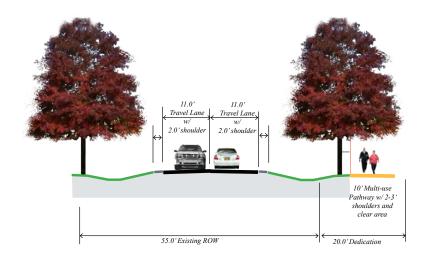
Accommodate a multi-use pathway along Gills Neck Road by reducing shoulder width to provide enough room for street tree planting outside of the drainage areas—thus helping retain the character of Gills Neck Road.
